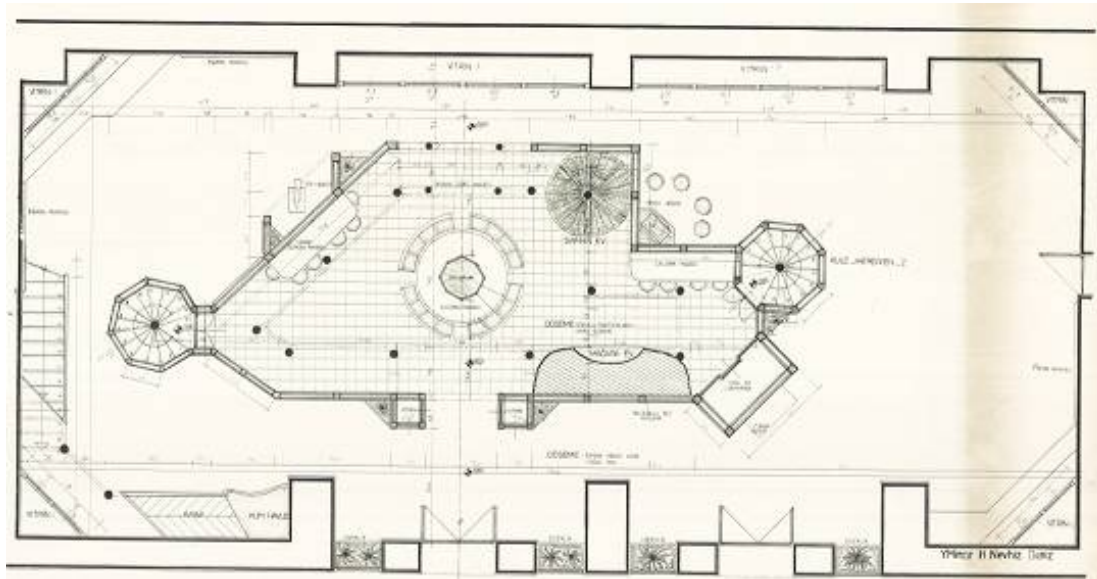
The proposed plan of the Children’s Museum – Entrance Floor Plan
